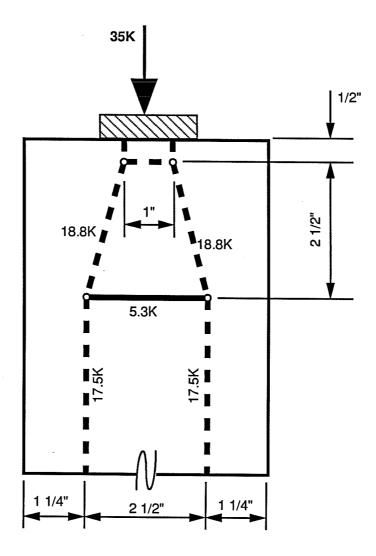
Transverse Slab Plane Strut & Tie Model
